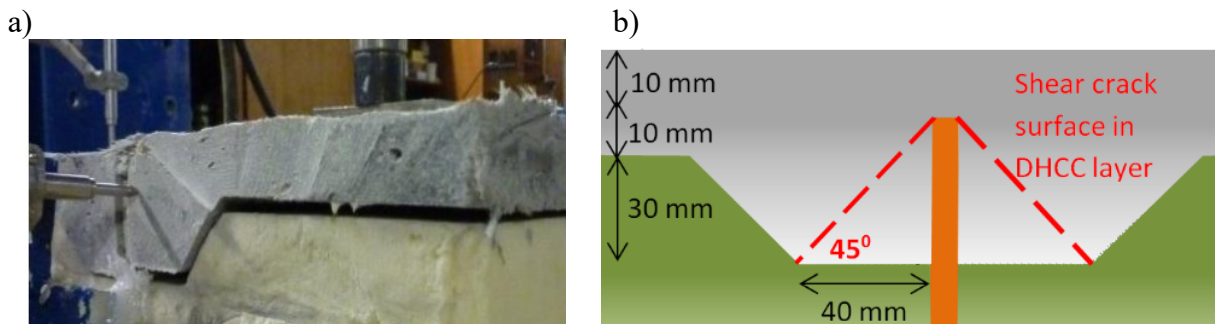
Damages after the hybrid slab test: a) slip and uplift, b) shear crack in concrete layer [102]
